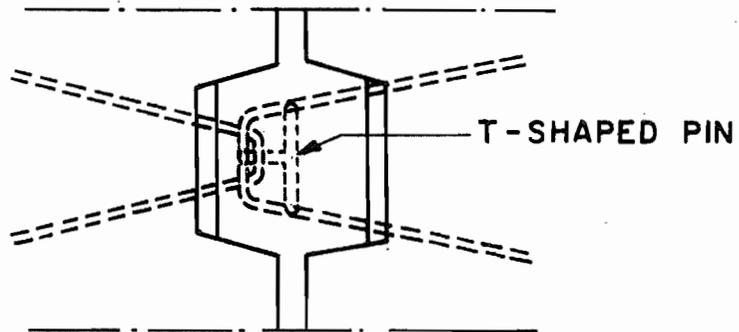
PLAN VIEW OF A LATERAL CONNECTION
